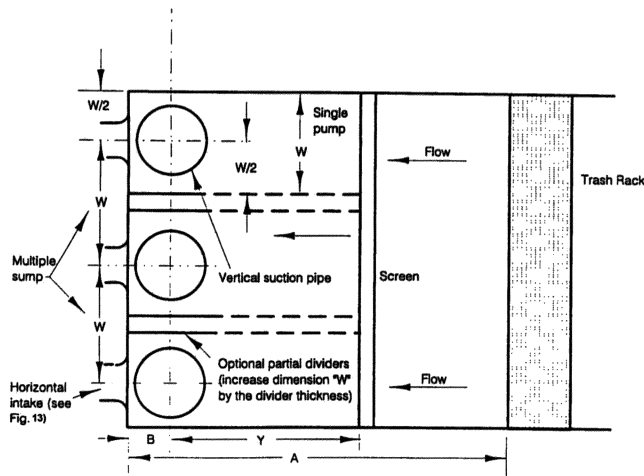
Sump Dimensions Plan View. (Courtesy of the Hydraulic Institute, 1994)
